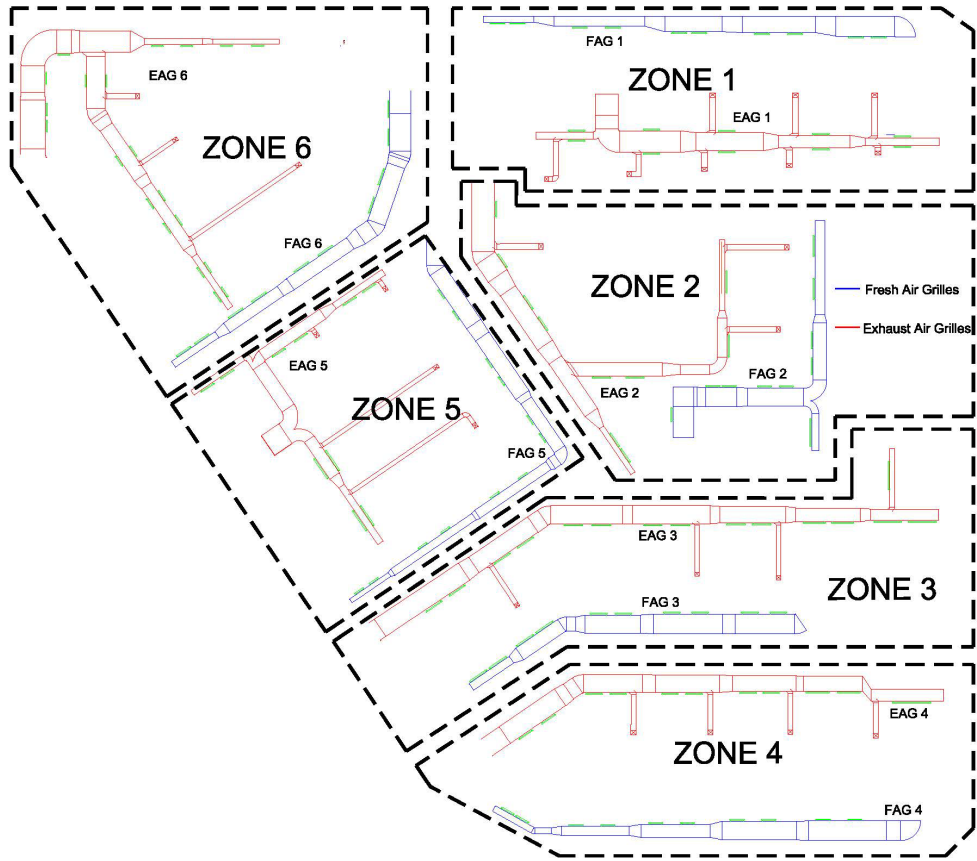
Existing layout design of ducted mechanical ventilation system
